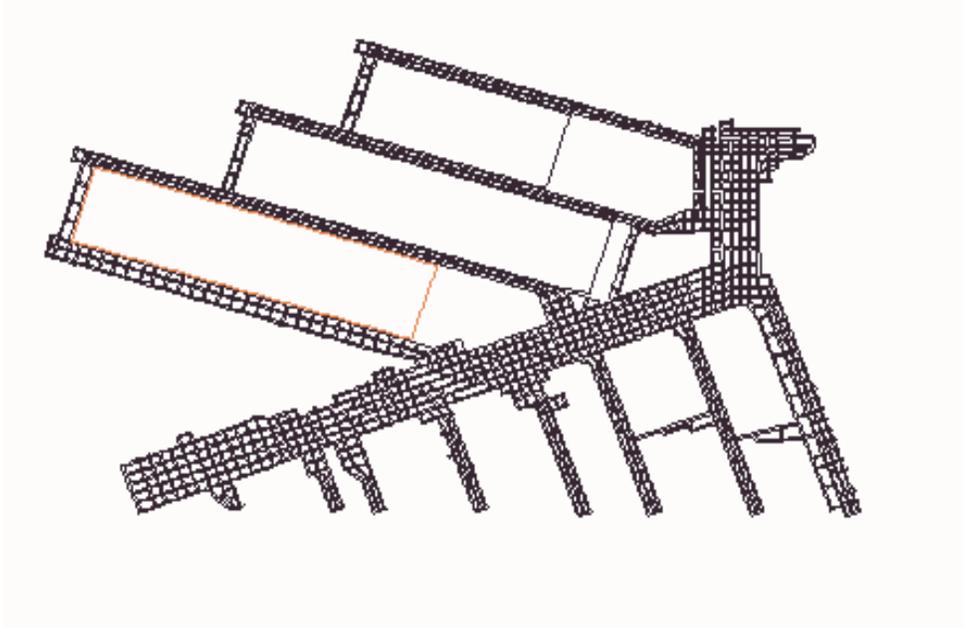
Digitized mineplan with 5 longwall sections
